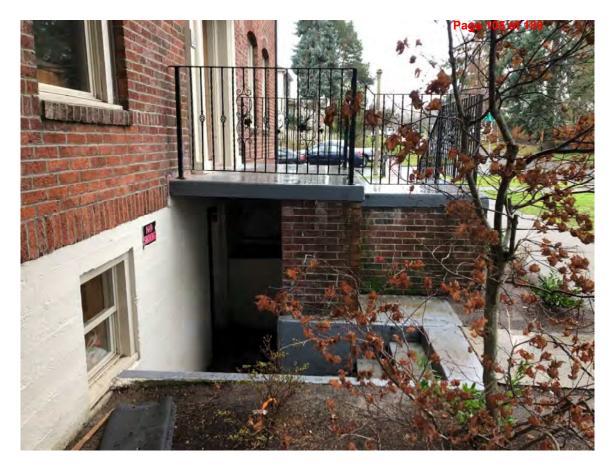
Newton Apartments, north façade, egress from Basement (below front porch), looking south. December 2019. Source: Stephen Day Architecture.
